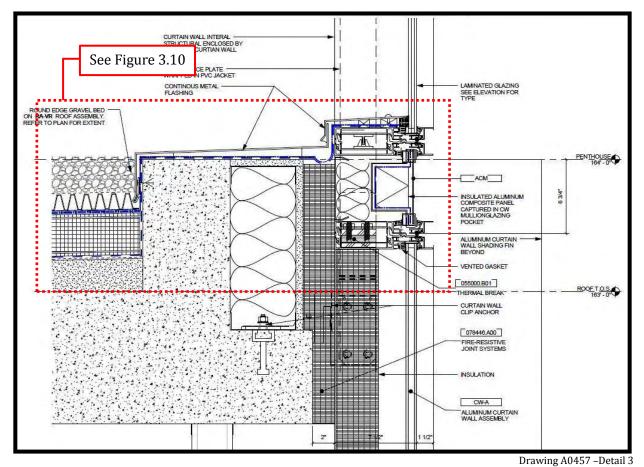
Waterproofing Detail at North Tower Exterior Section
